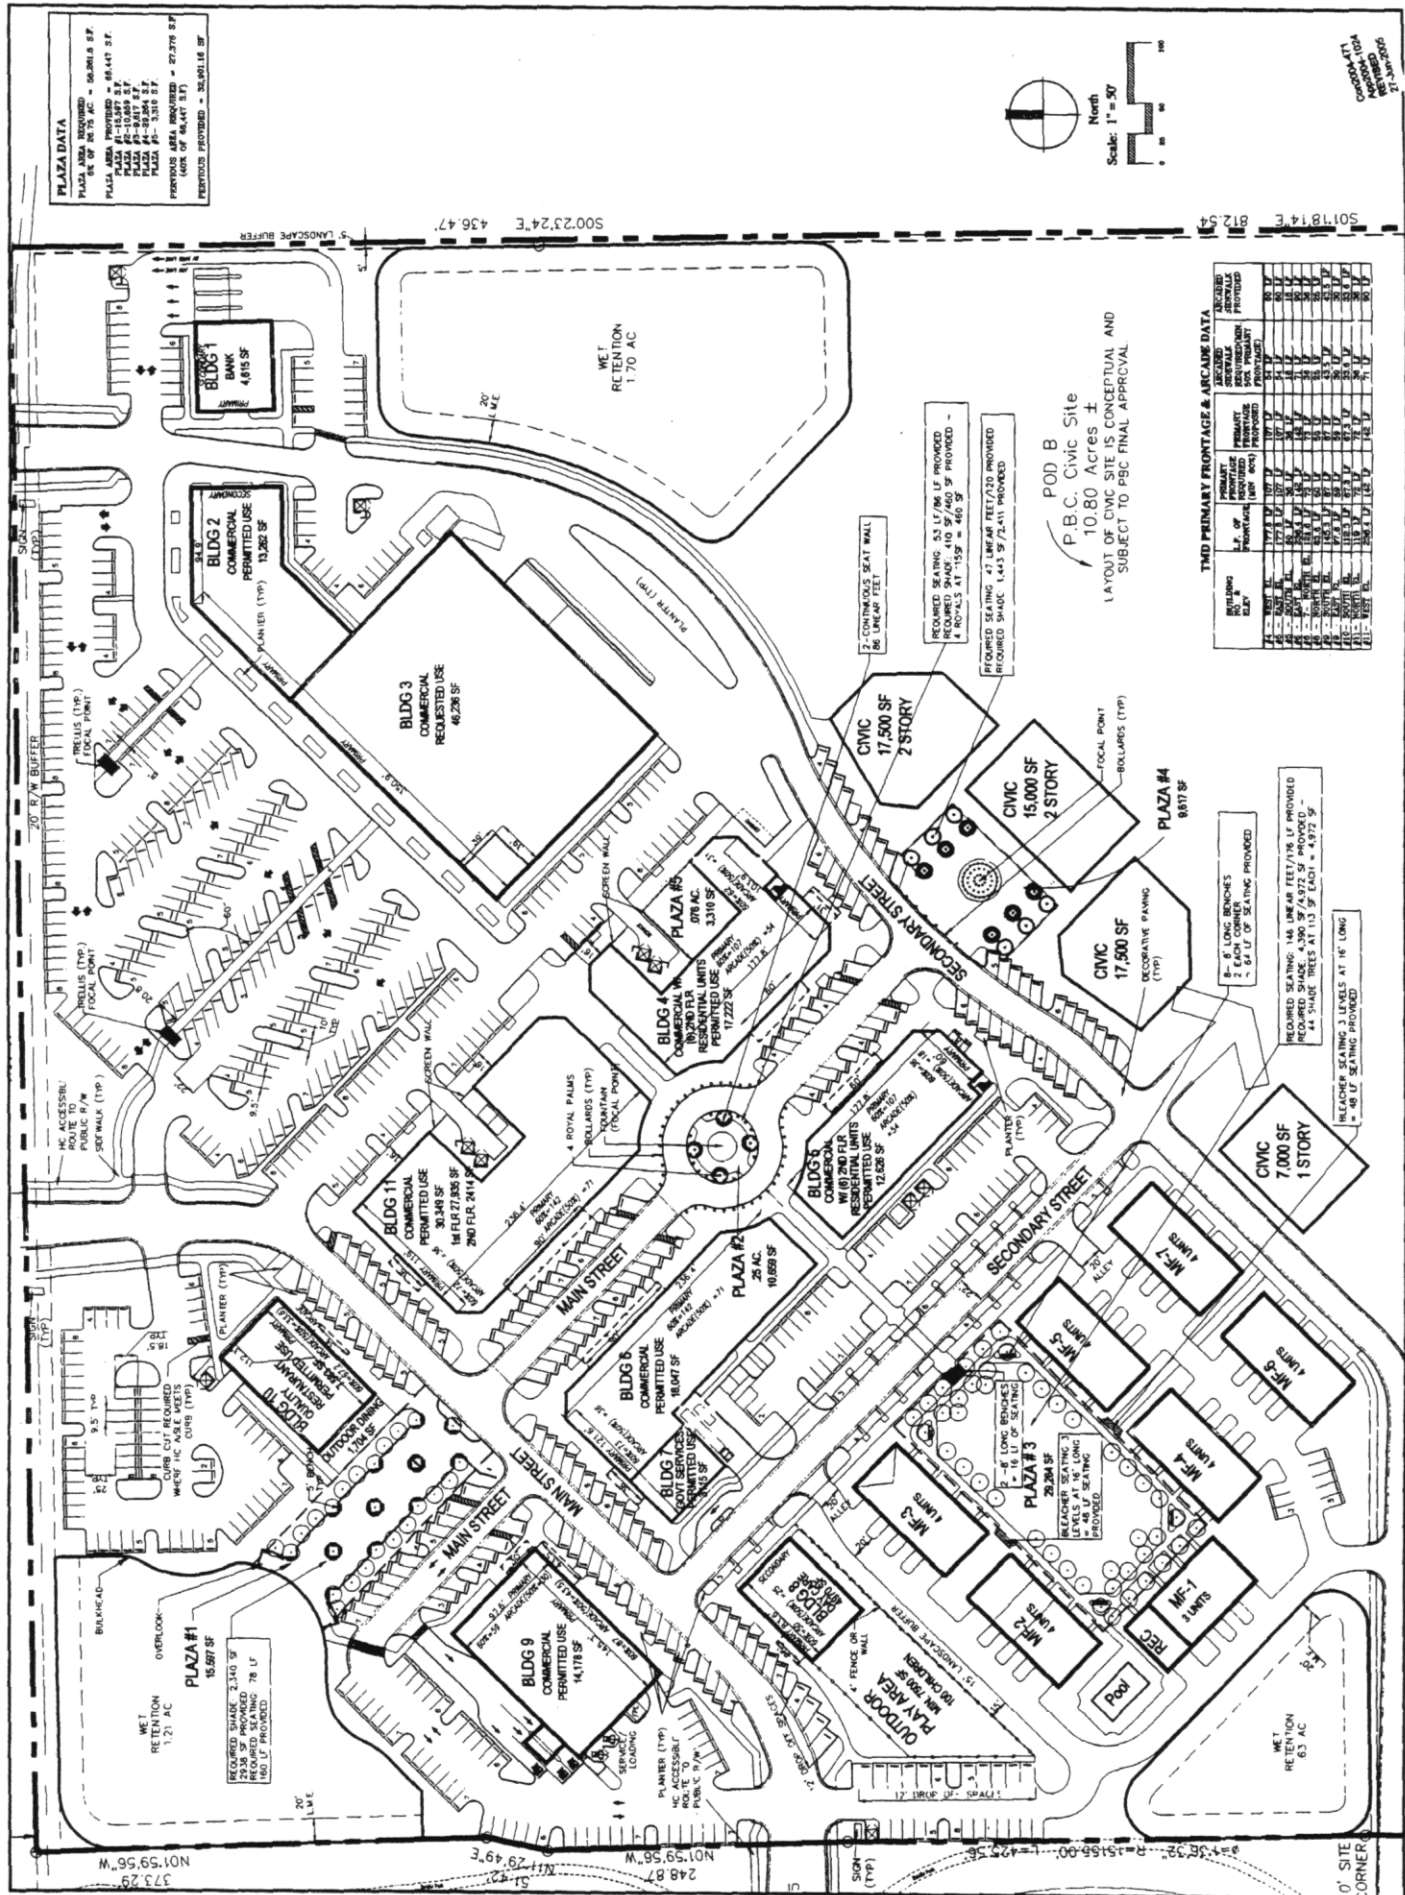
"Beauty Contest" Site Plan Pod A approved August 25, 2005
